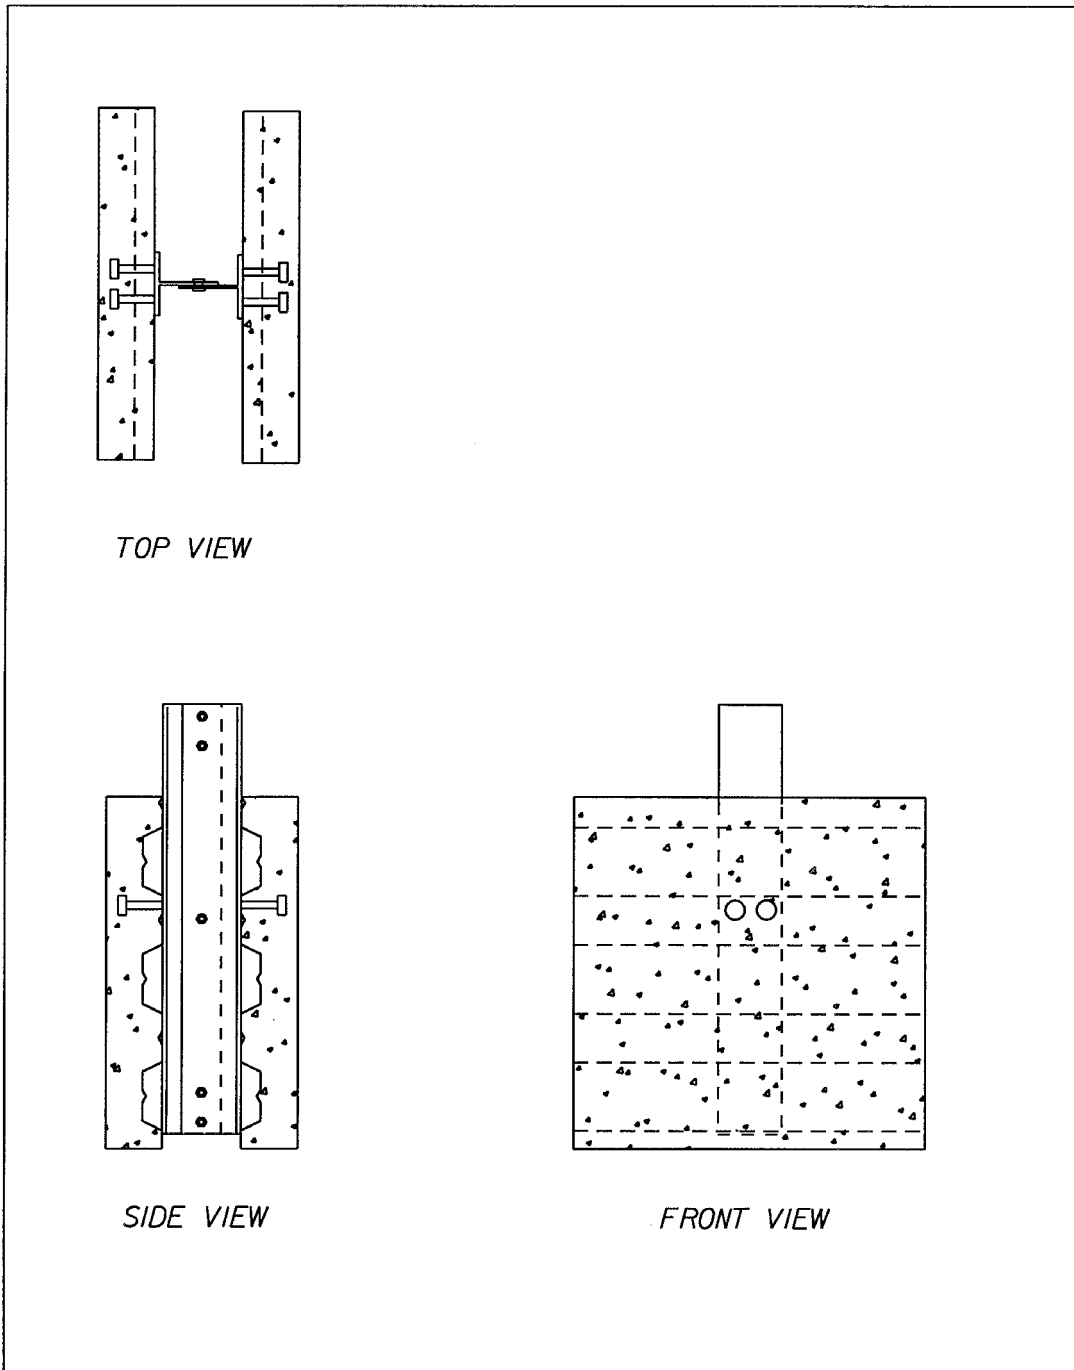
Composite Slab Push-Out Specimen with Studs in the "2Strong" Position (Welded Wire Fabric not shown)
